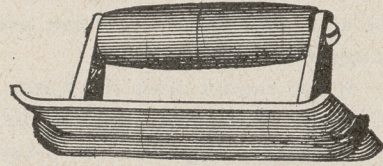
JOINTER USED IN DIVIDING WALK INTO SECTIONS.
